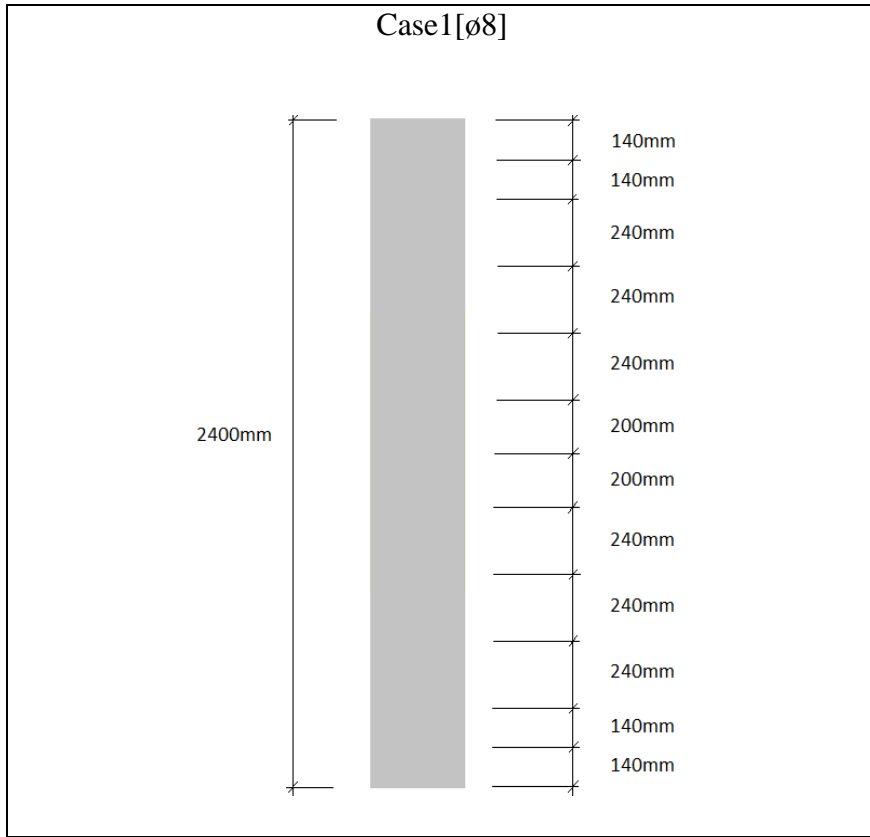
Case1 with a stirrup cross section of 8mm.
